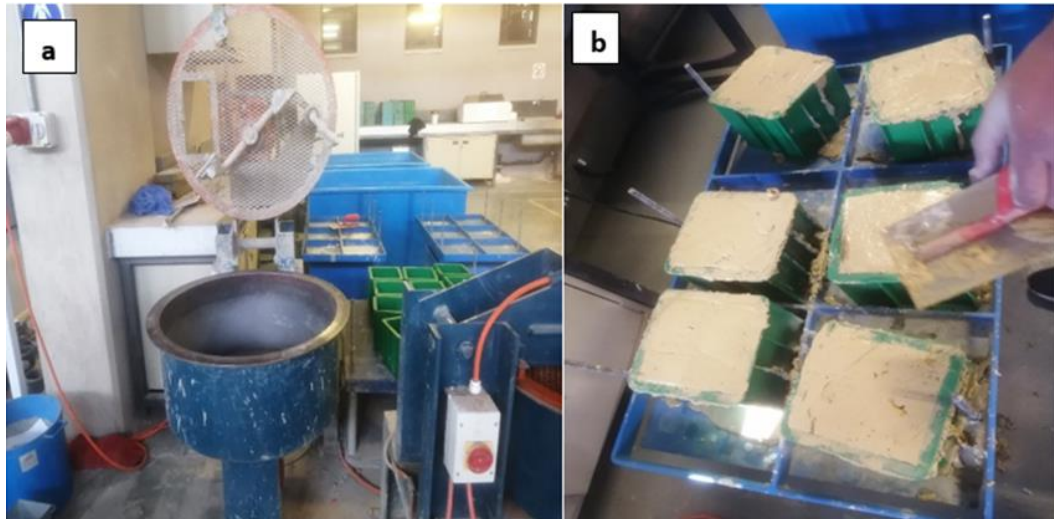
(a) A concrete mixer used to mix CTB slurry; (b) Casting CTB slurry into a cubic mould.
